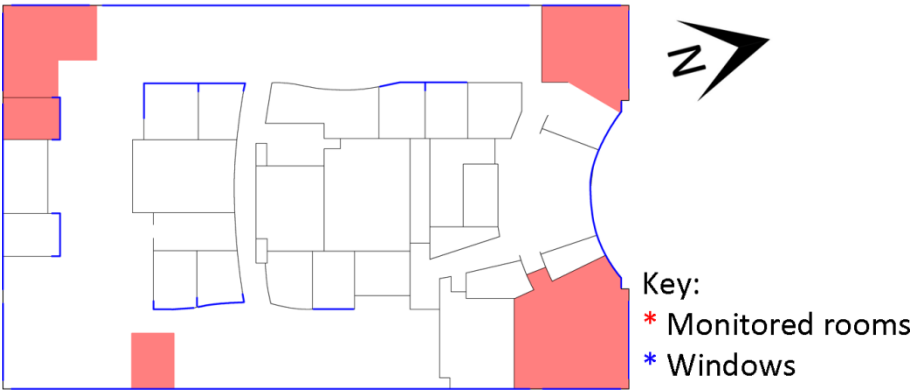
Floor plan illustrating level 3 in Building 2 (Not to scale)
